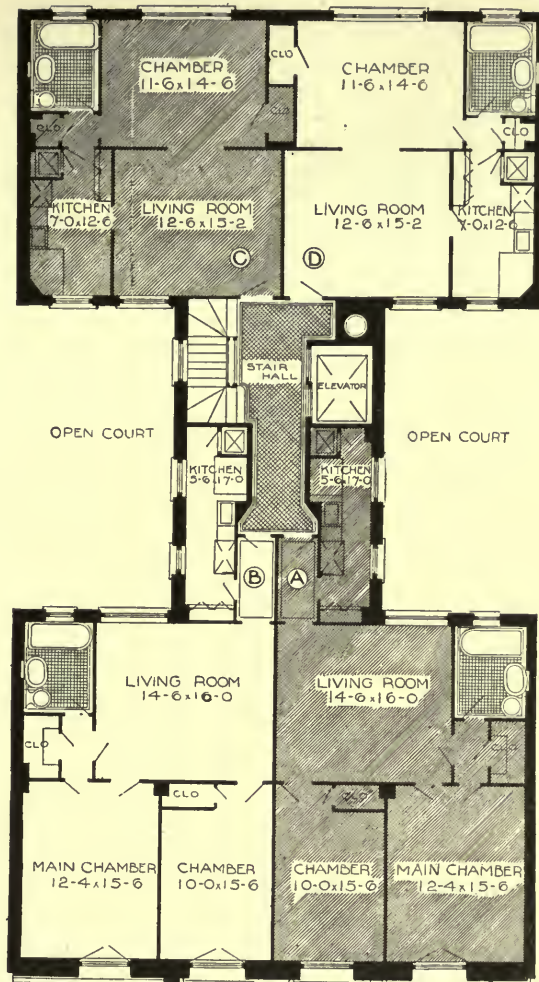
TYPICAL UPPER FLOOR PLAN—NOS. 140 AND 142 WEST 55TH STREET, NEW YORK CITY. Schwartz & Gross, Architects.
